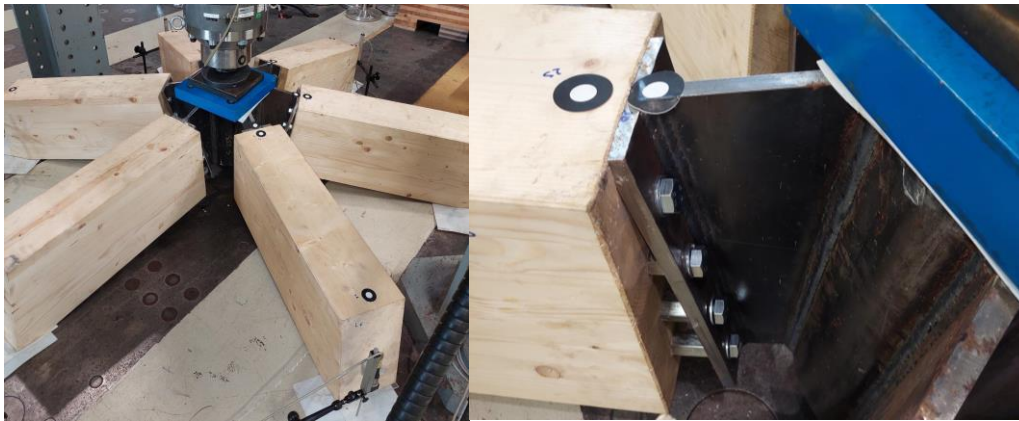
Test specimen after the load-bearing test (left: whole specimen; right: close-up view of the ruptured glued-in threaded rod connection of a single glulam beam).
